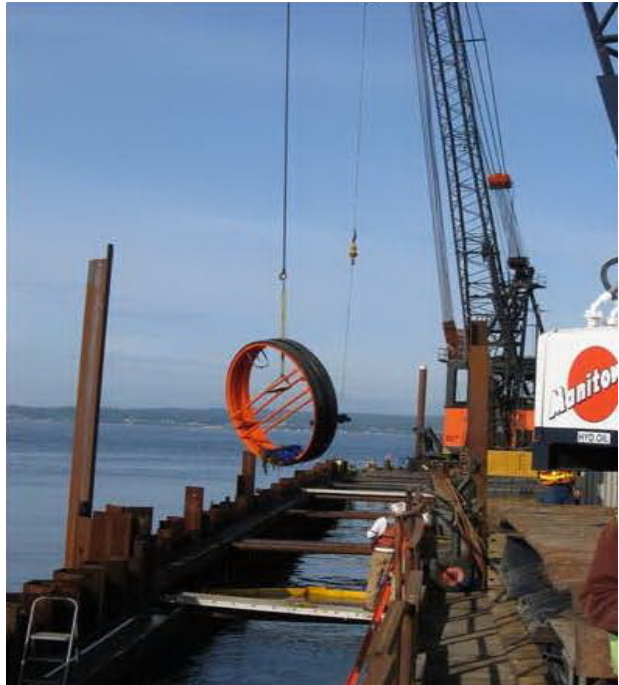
Figure B – Trench shoring and work platform. Joint testing jig is about to go in the water.
